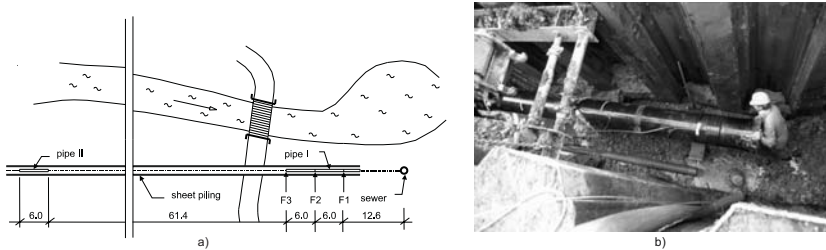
On-site measurements: a) site plan; b) installation of a pipe.
